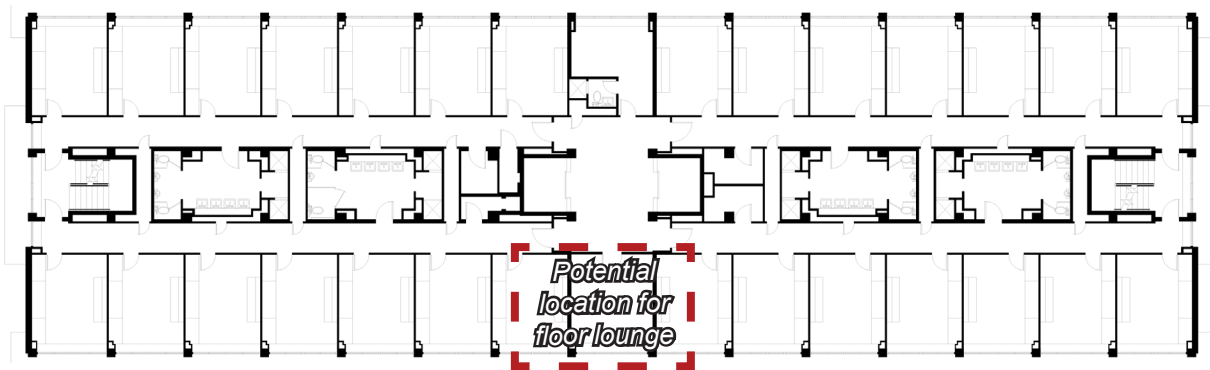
(above): Existing second floor plan of Yocum with proposed improvements (not to scale)
